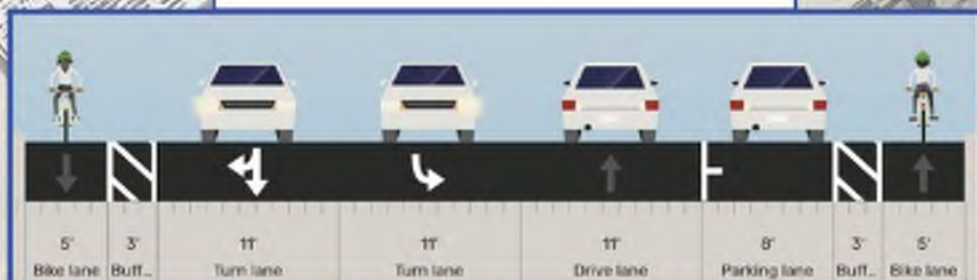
DETAILED PLAN FOR MAIN ST. FROM CASS AVE. TO MARKET ST. PROVIDED IN APPENDIX A.
